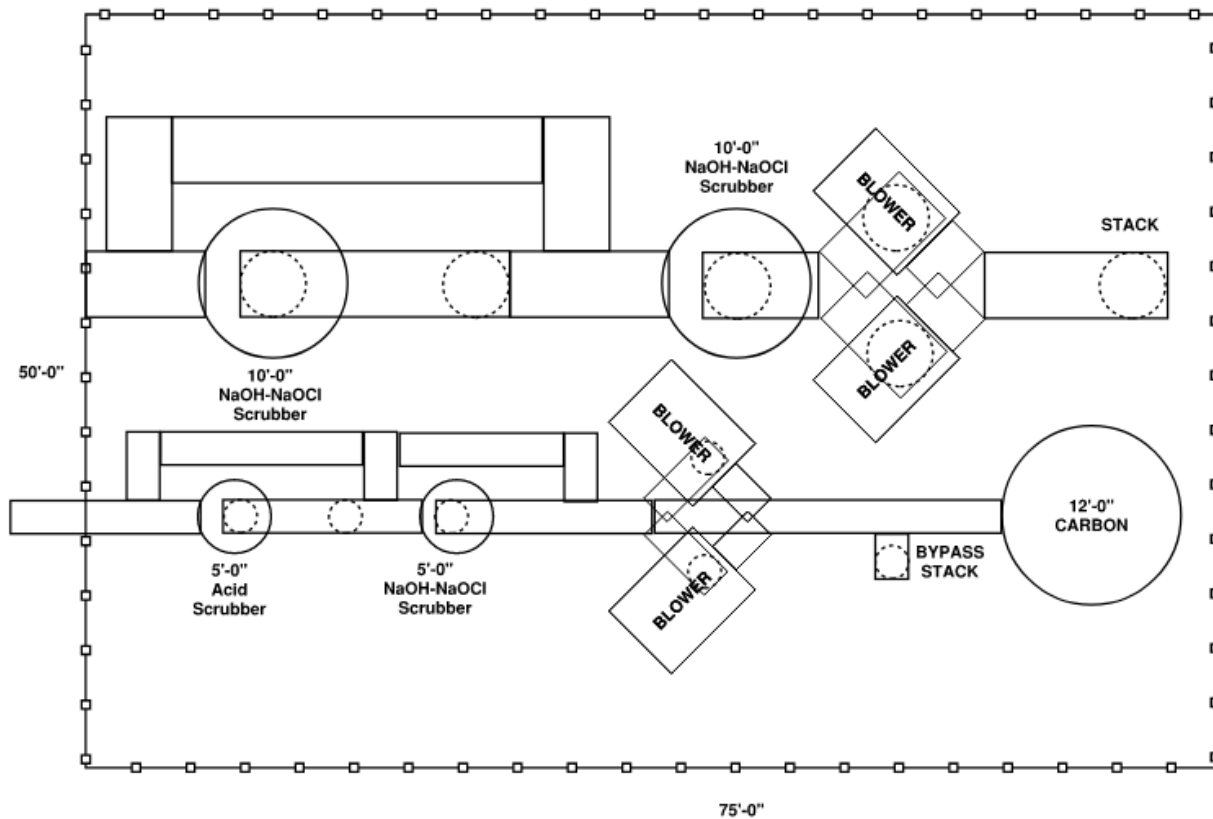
Layout of Pad for Odor Treatment Systems under Alternative 1
